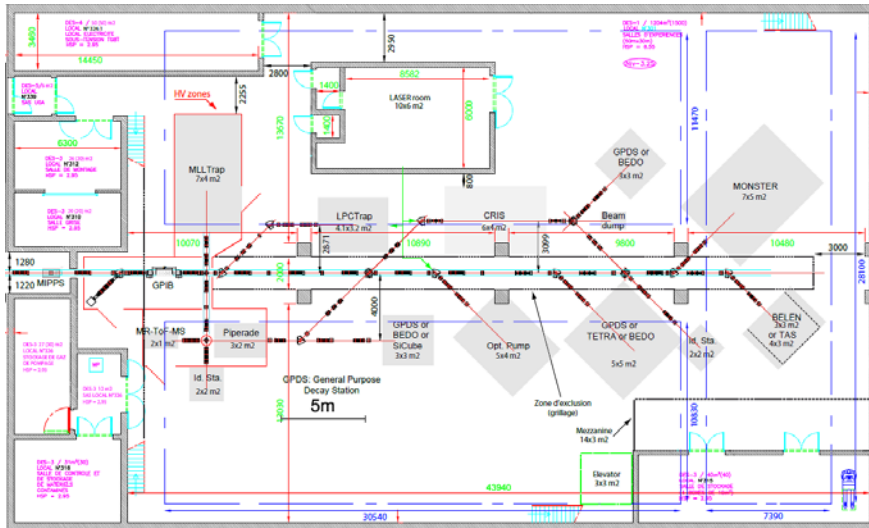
Proposed layout of the technical rooms and the experimental equipment at the main floor of the DESIR hall.
